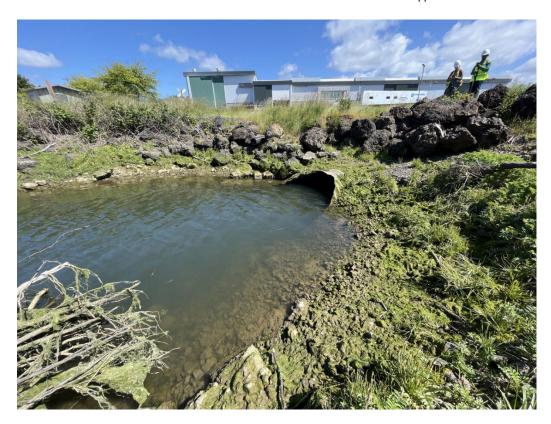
Overview of Fry Creek, south of the culvert. Photo taken facing northwest.
